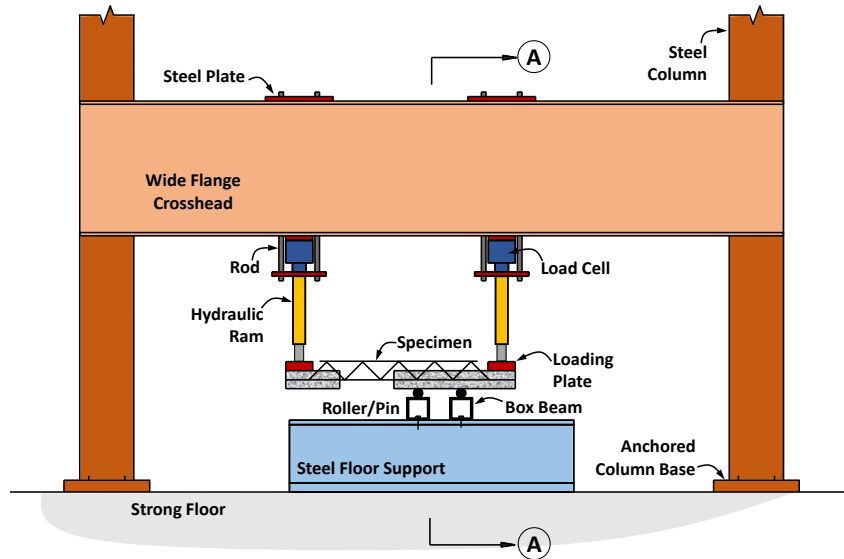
Arrangement of loading rams and supports to generate shear in the wire trusses
